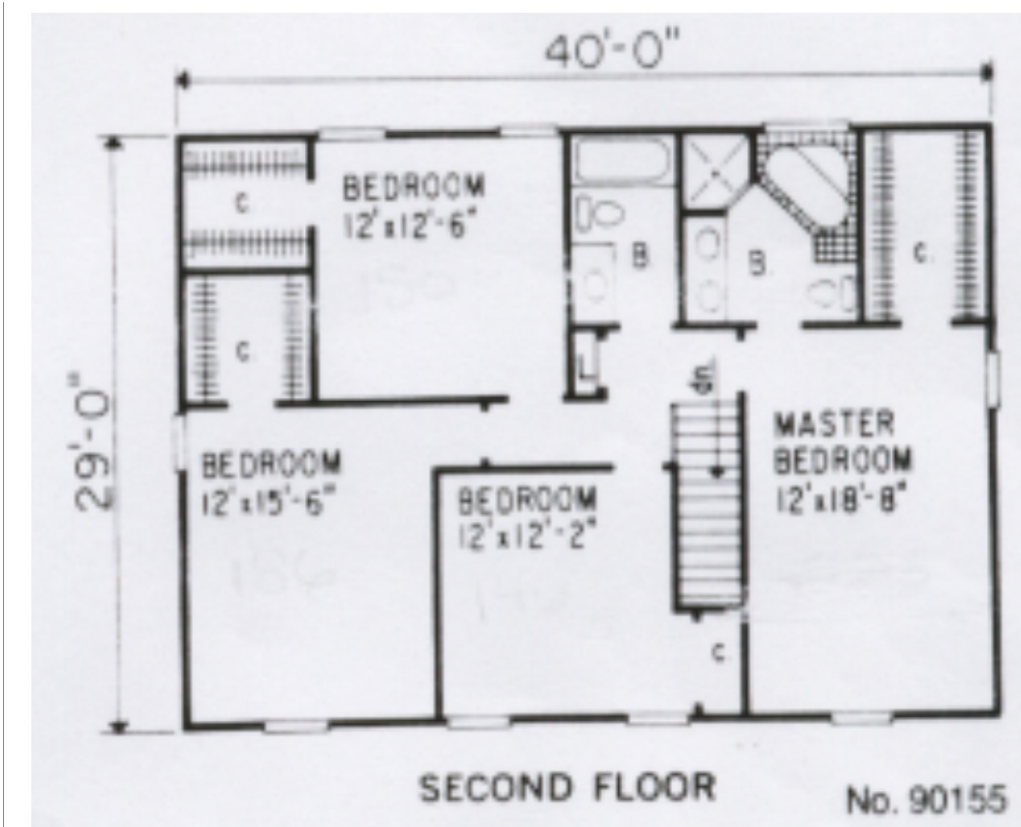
Exhibit C: Garlinghouse Incorporated. "North America's Top Selling Home Plans".
